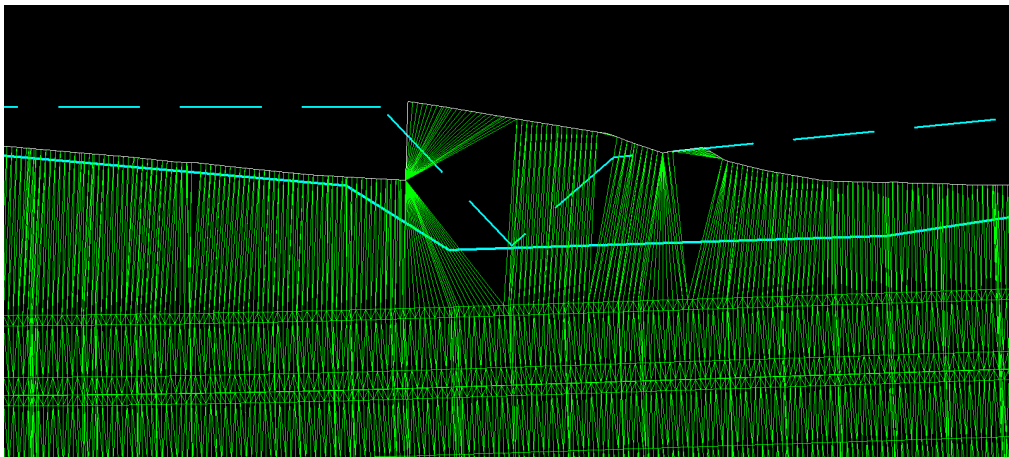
Surface Details Lie Beyond the Temporary Easement Line
